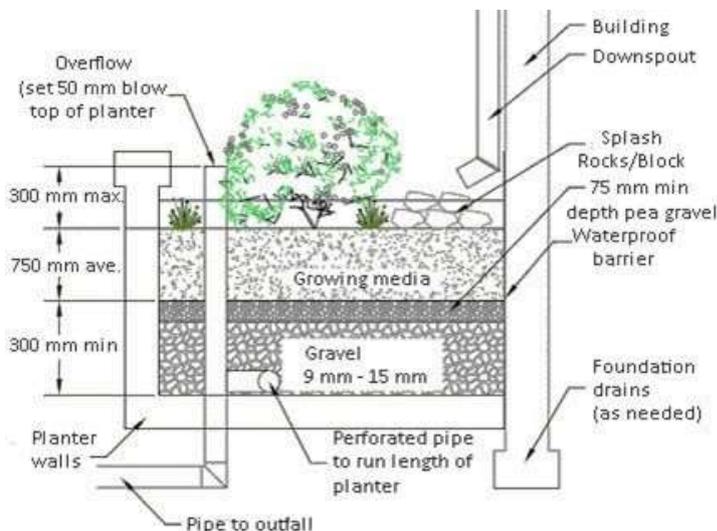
Schematic of a planter box cross section¹⁰⁸
